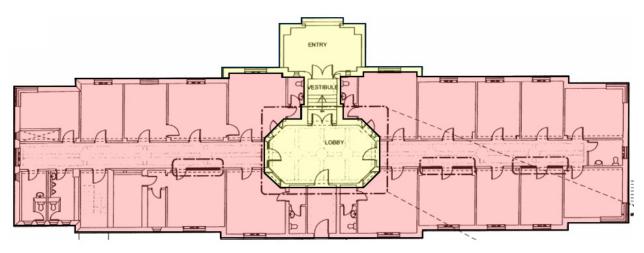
Diagram showing retained sections of the building for Option 4 'retention of central section of north façade, lobby and rotunda'
